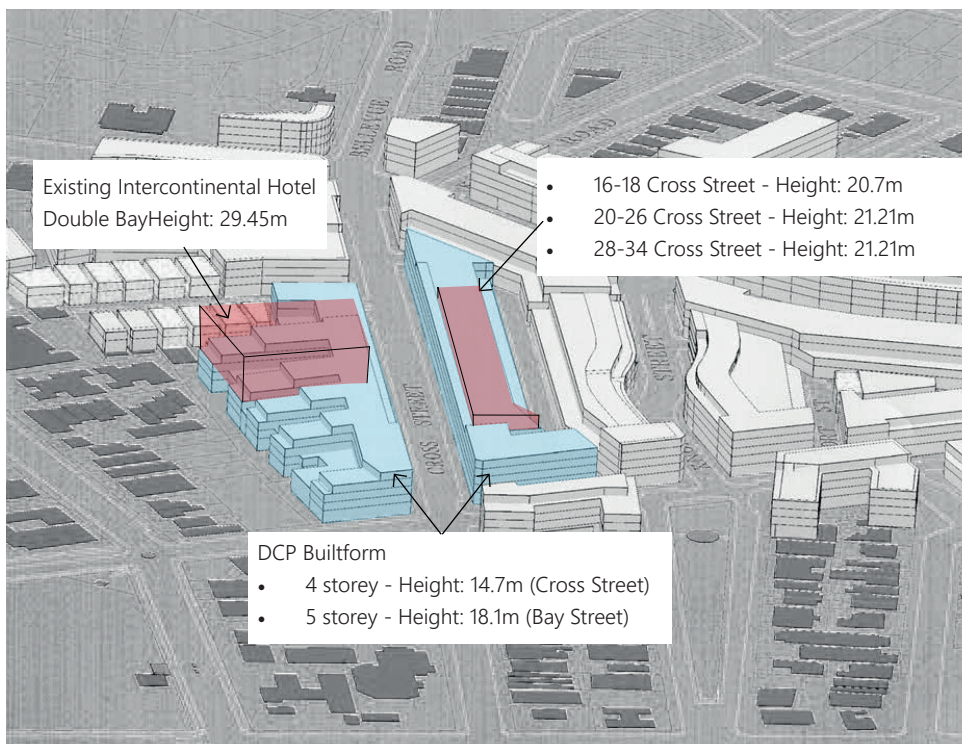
3D view of building envelopes (Source: Woollahra Development Control Plan 2015)
